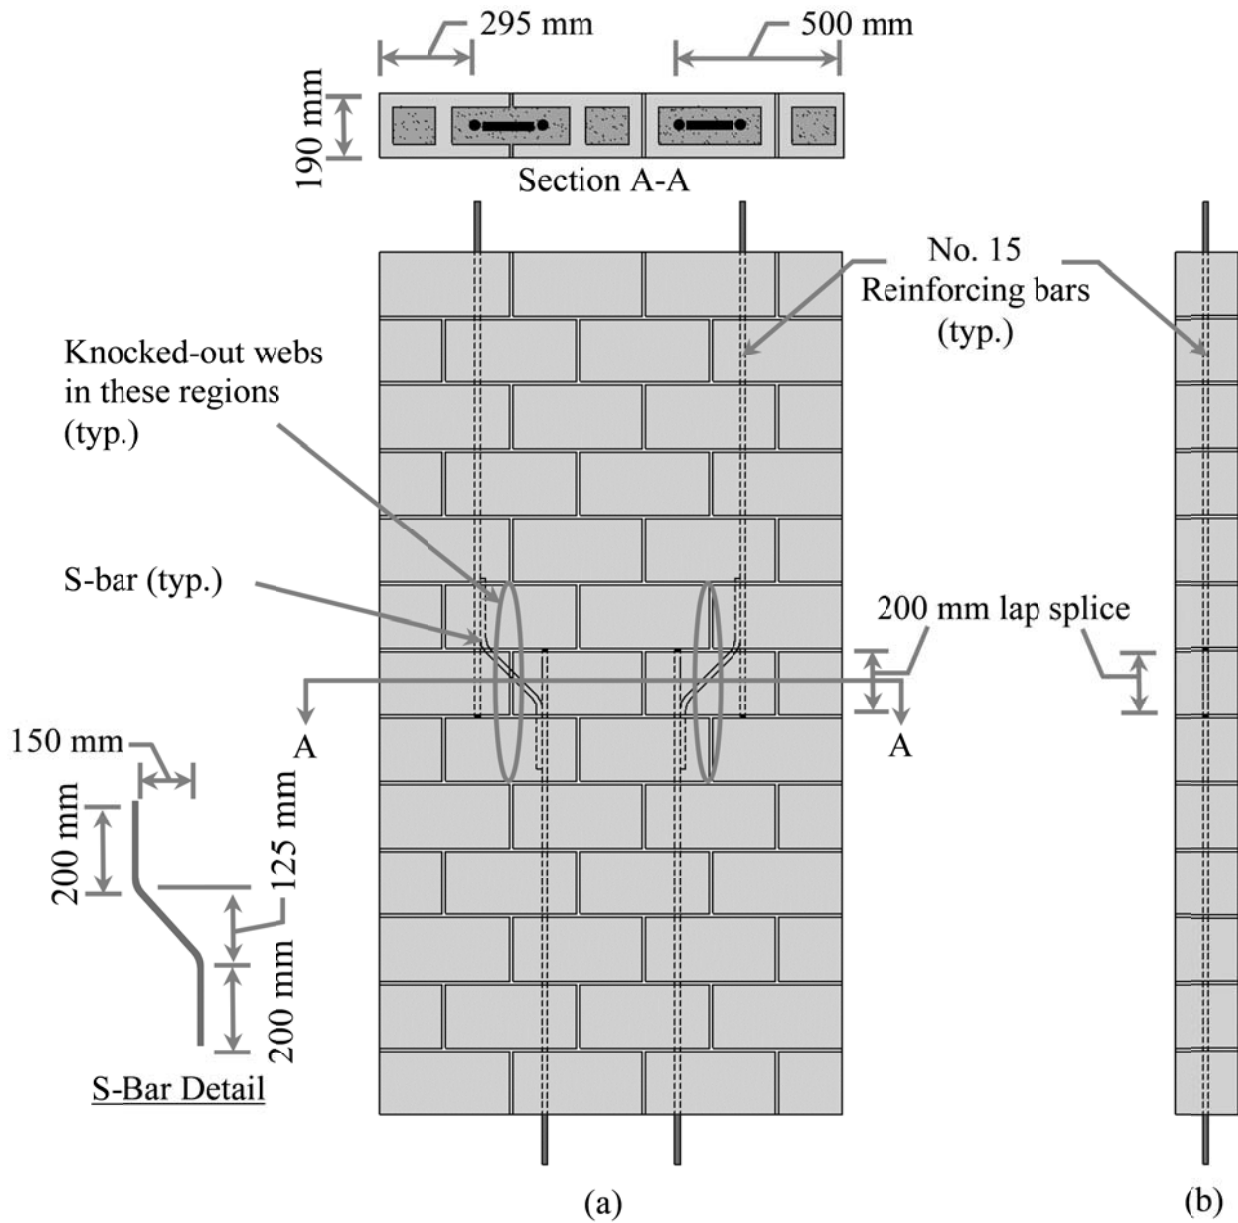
Remedial Wall Splice Specimen with S-Shaped Splice Reinforcement and Grouted Confinement Cells (C-SBAR): (a) Elevation Including a Section at Splice Level, and (b) Side Profile.
